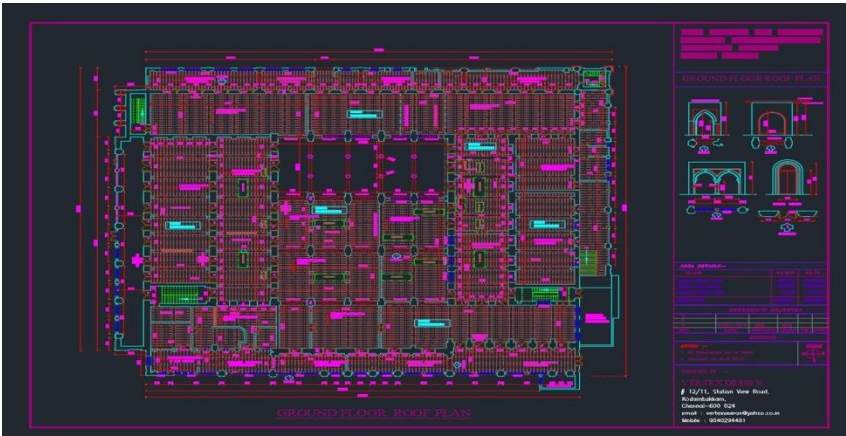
b. Shows the Plan layout of the Humayun Palace in the format of a CAD drawing.
